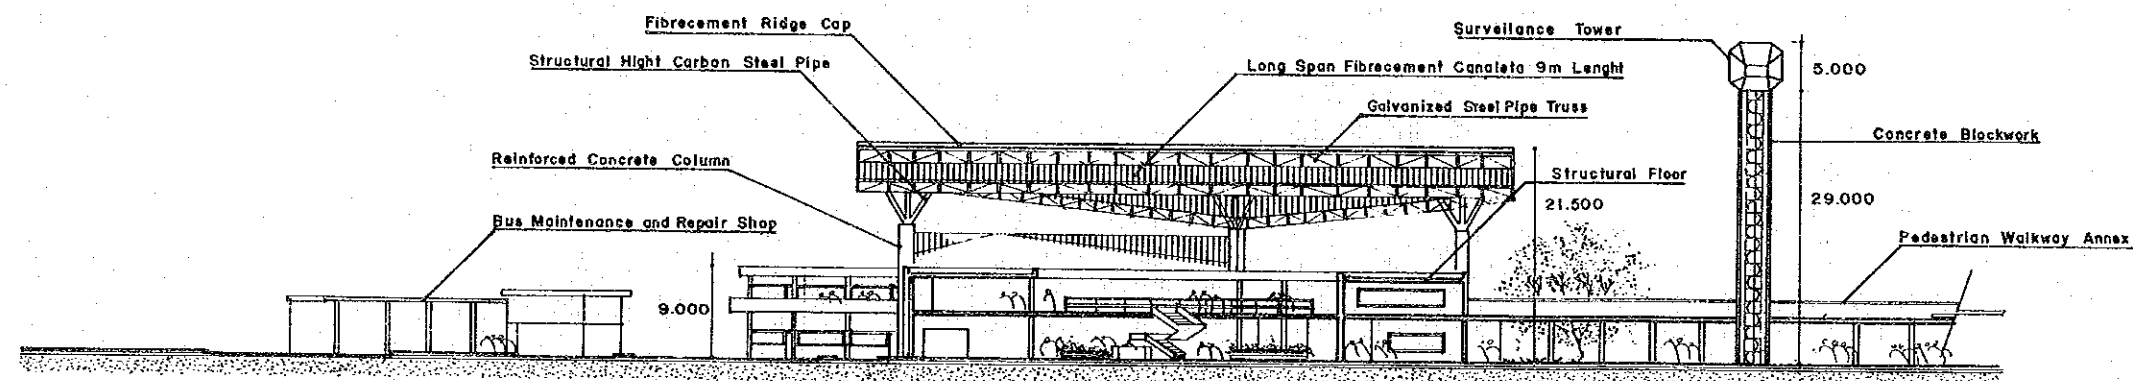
ELEVATION PLAN OF INTERMUNICIPAL BUS TERMINAL
